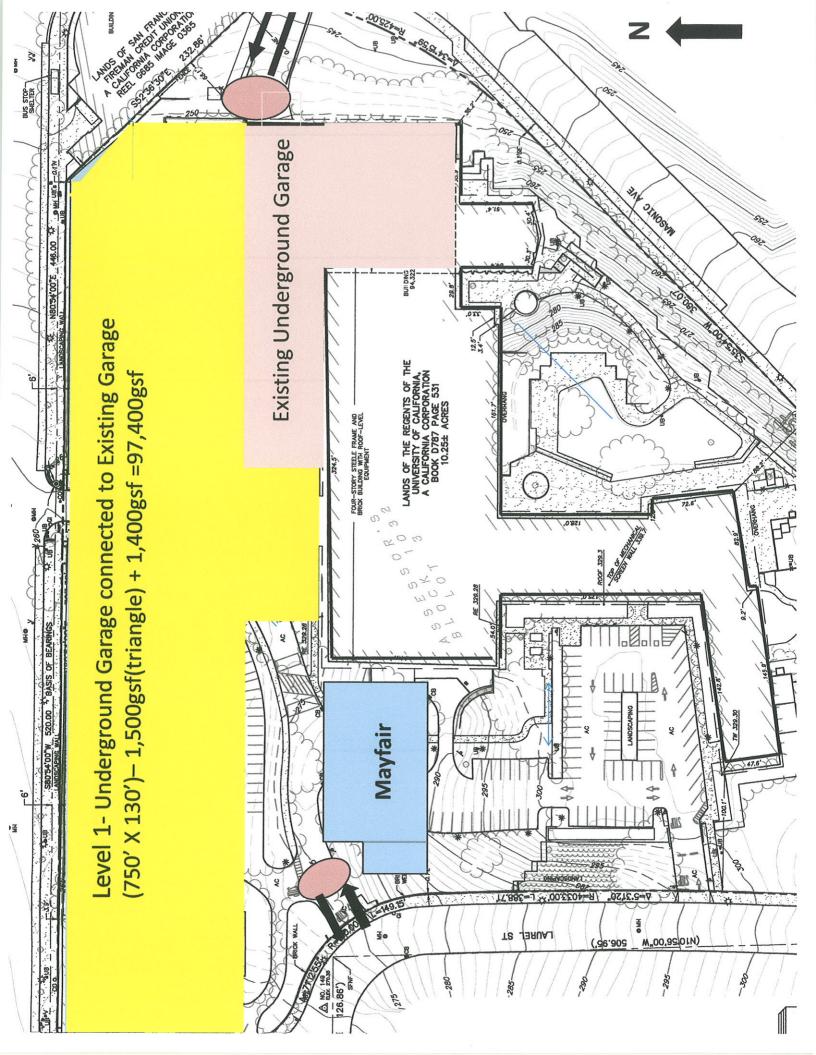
PROPOSED CALIFORNIA STREET GARAGE AND CENTER BUILDING B GARAGE - BASEMENT LEVEL B1
